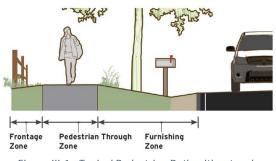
Typical Pedestrian Path without curb Source: FHWA
